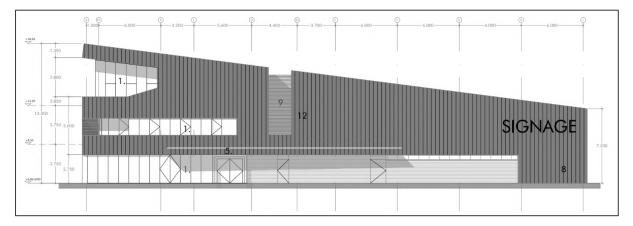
Southern Elevation of Typical OMF Building (Extract from Drg. No. GA 200 01)
